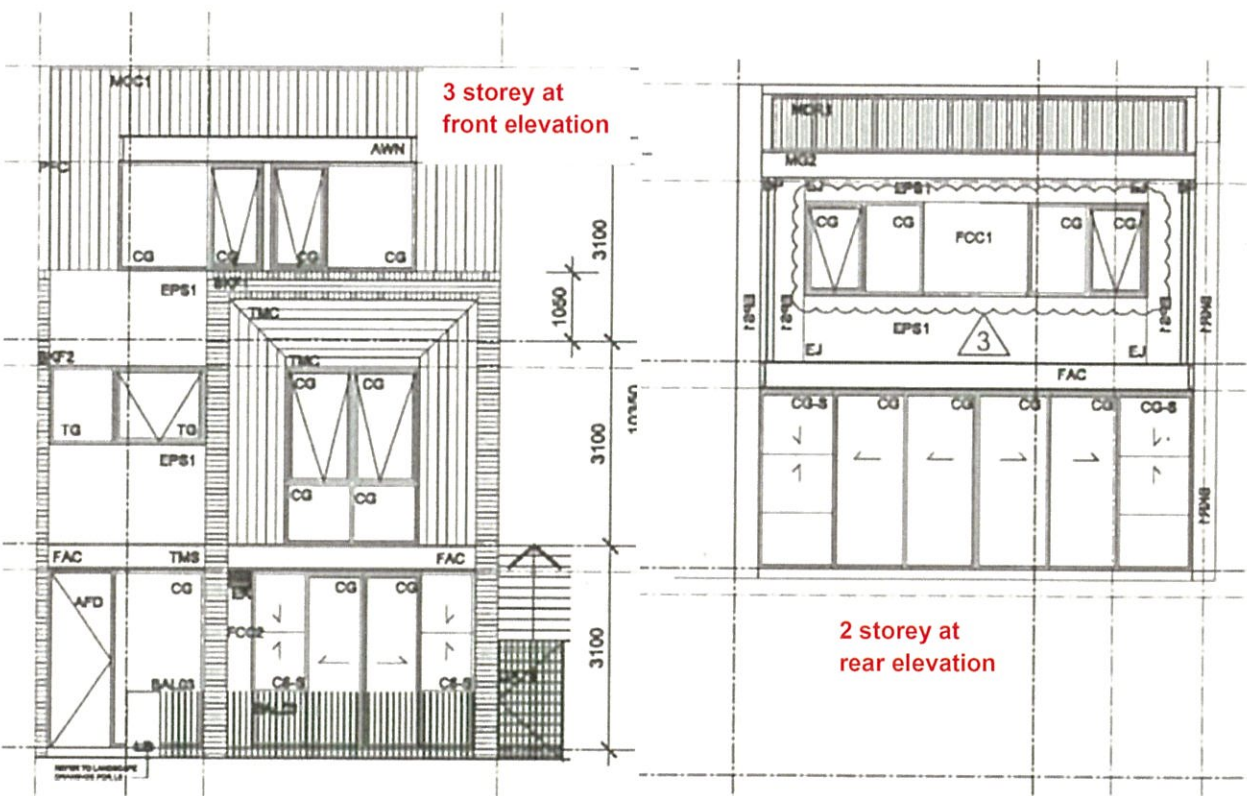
Extract of rear elevation plan showing height breach at front and rear and amount of fill proposed from existing ground line
